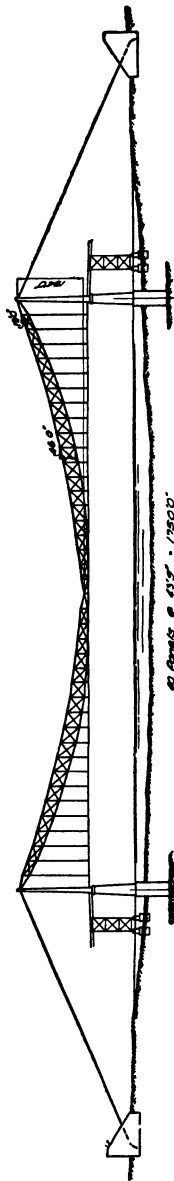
Layout of Eye-bar-Cable Suspension-Bridge.
